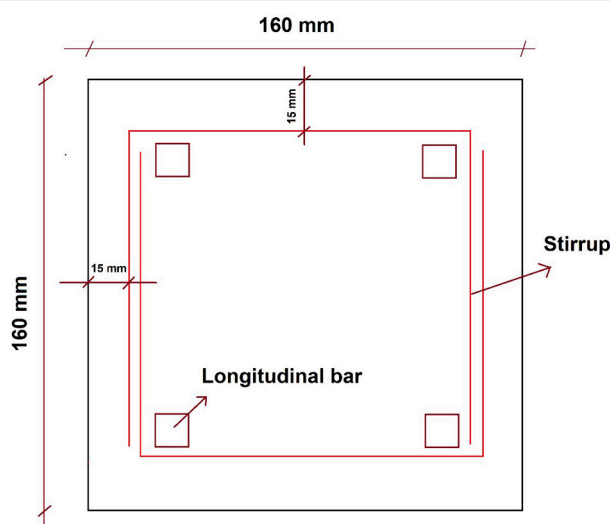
| Cross section of bamboo composite reinforced concrete beam.
